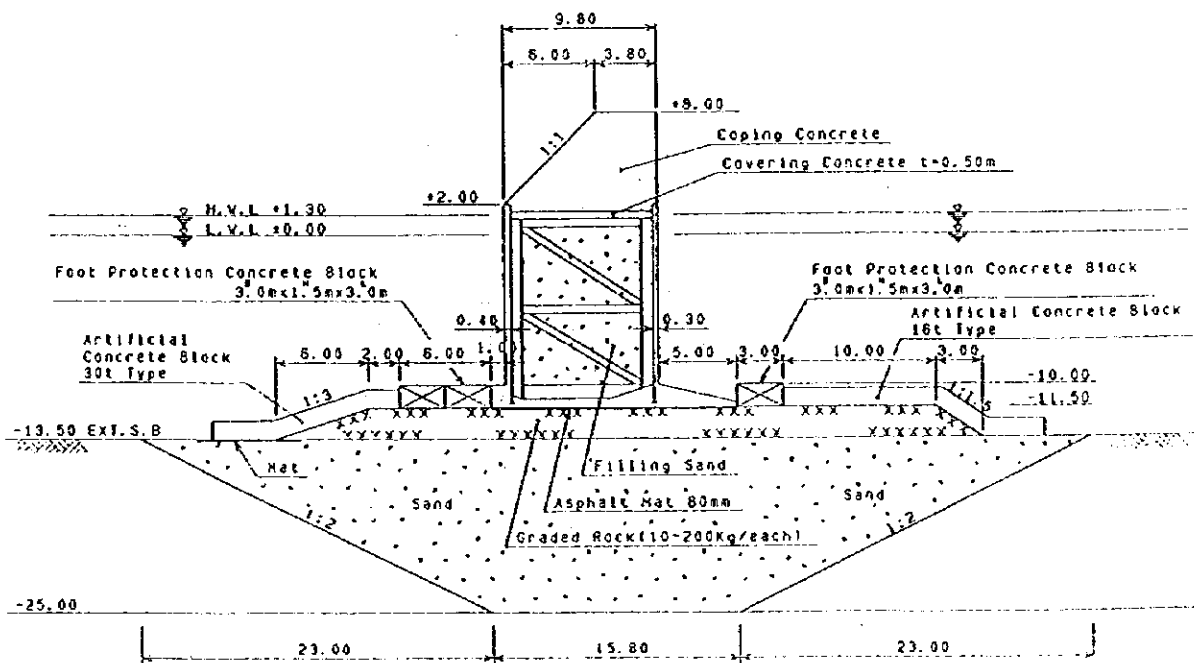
Typical Cross Section of Breakwater in Chan May (Hybrid Caisson)
